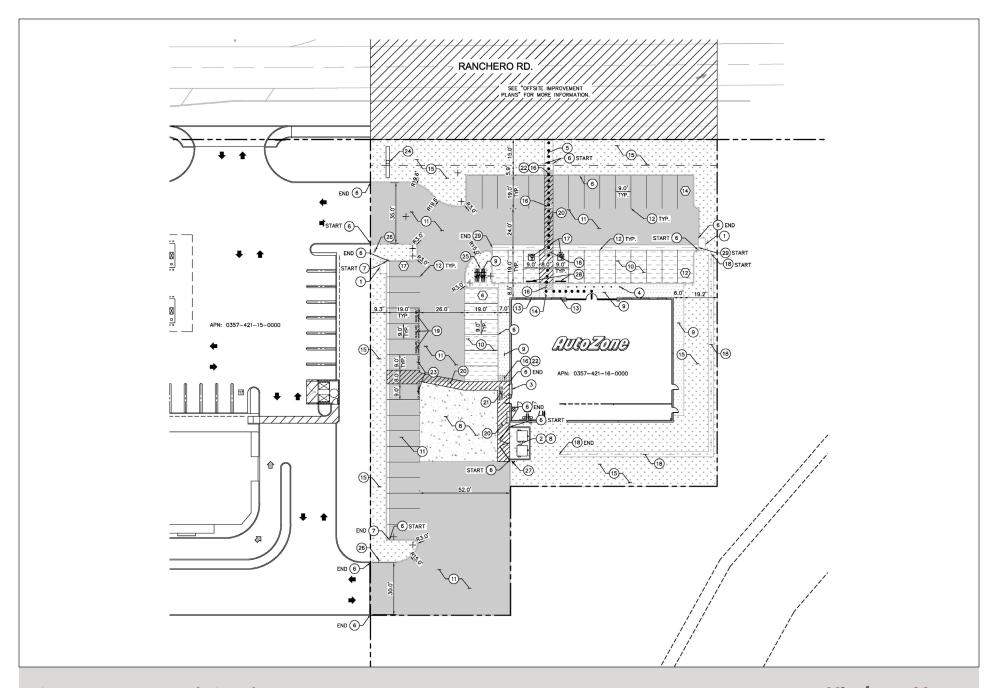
Conceptual Site Plan Oak Hills Autozone Project
